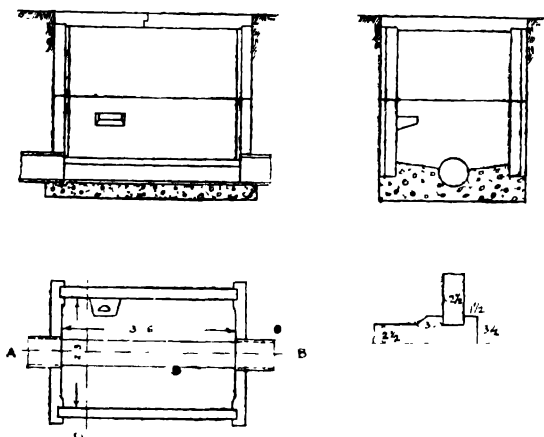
Detail of Concrete Slab Inspection Chamber.
